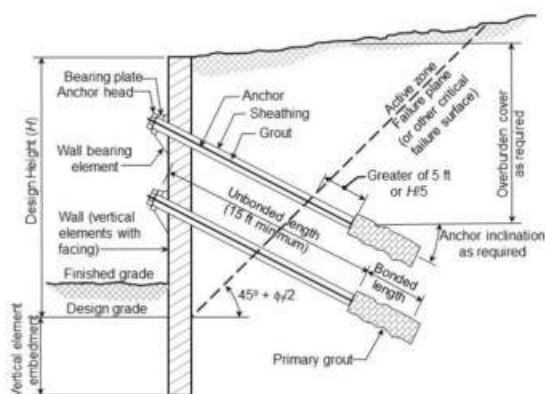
Anchored Wall Nomenclature and Anchor Embedment Guidelines
